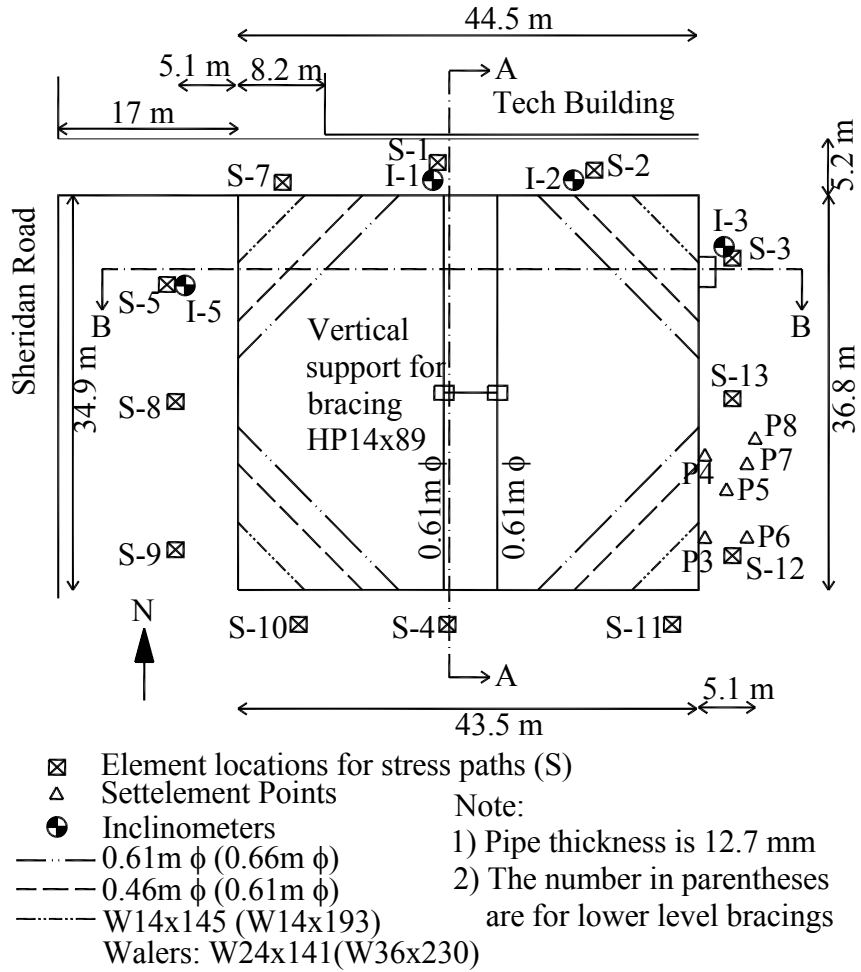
Plan view of Ford Center excavation, modified after Blackburn (2005)
